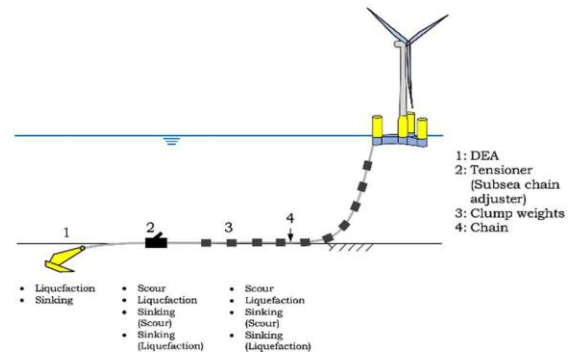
Anchoring system of a floating platform with subsea structures, with modes of failure (scouring and liquefaction) indicated.
